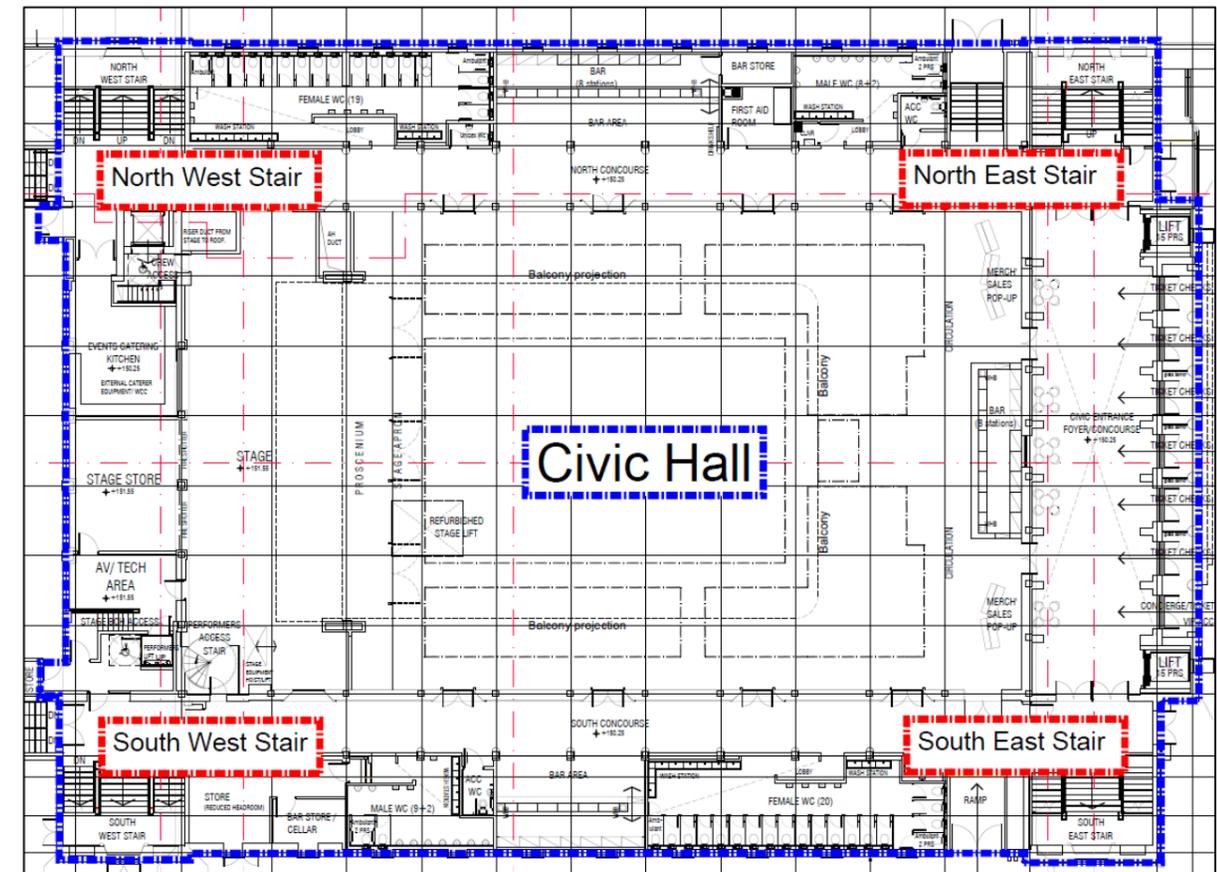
Schematic plan of the proposed ground floor (Civic Hall)
